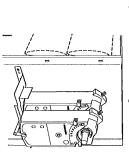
Tandem Mounting on Same Side of Damper Shaft.
